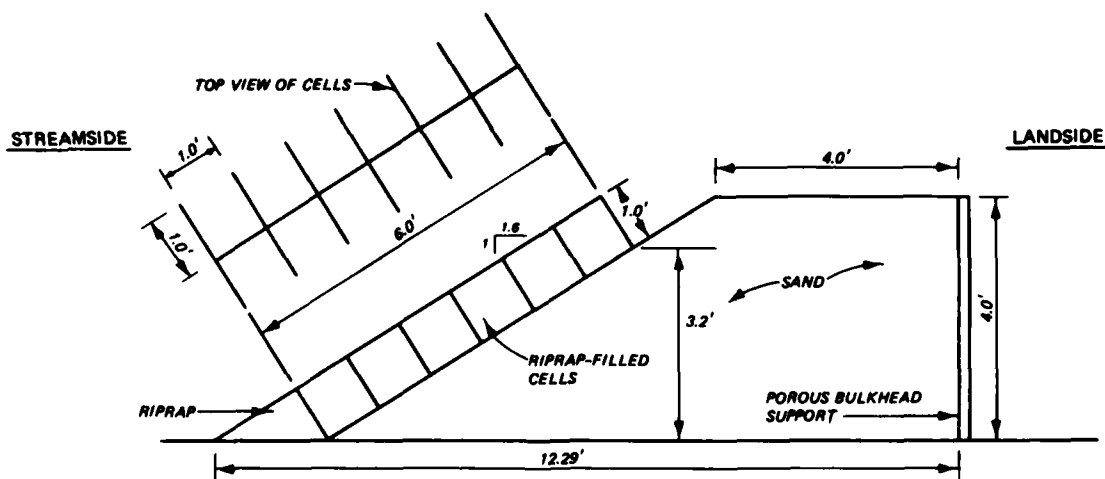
Plan 8, sand streambank with riprap-filled cells protection
